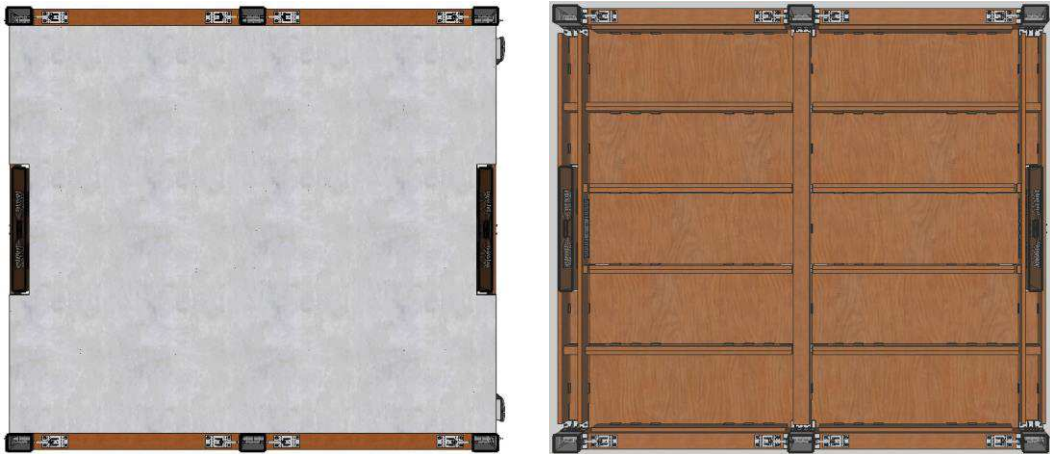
Timber-Concrete Composite floor on the first level of the Skeleton Building: view from the top (left) and view from the bottom (right).
